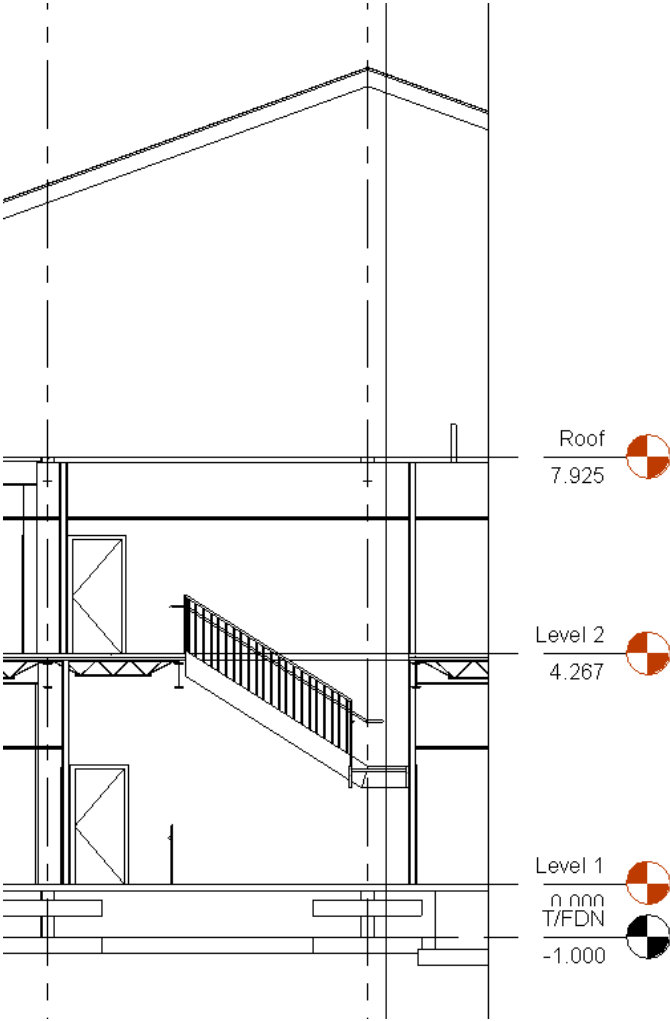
Scaled sample detailed section of a project (Standard office project Revit file from National Building Information Model Standard)
